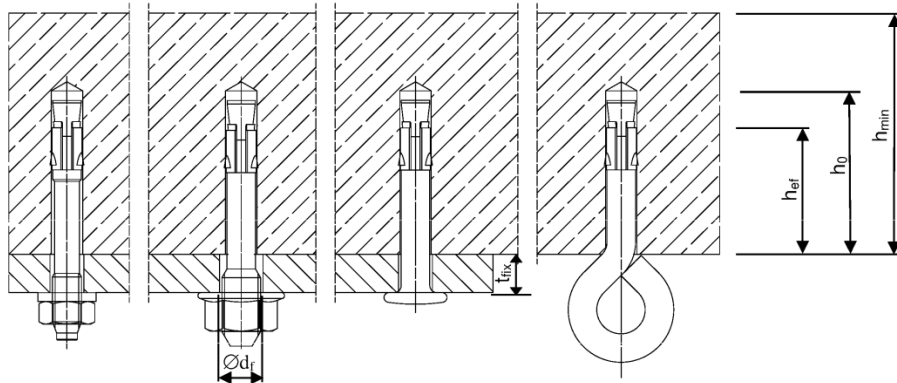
fischer nail anchor FNA II: Geometry in installed condition, see [P1]
